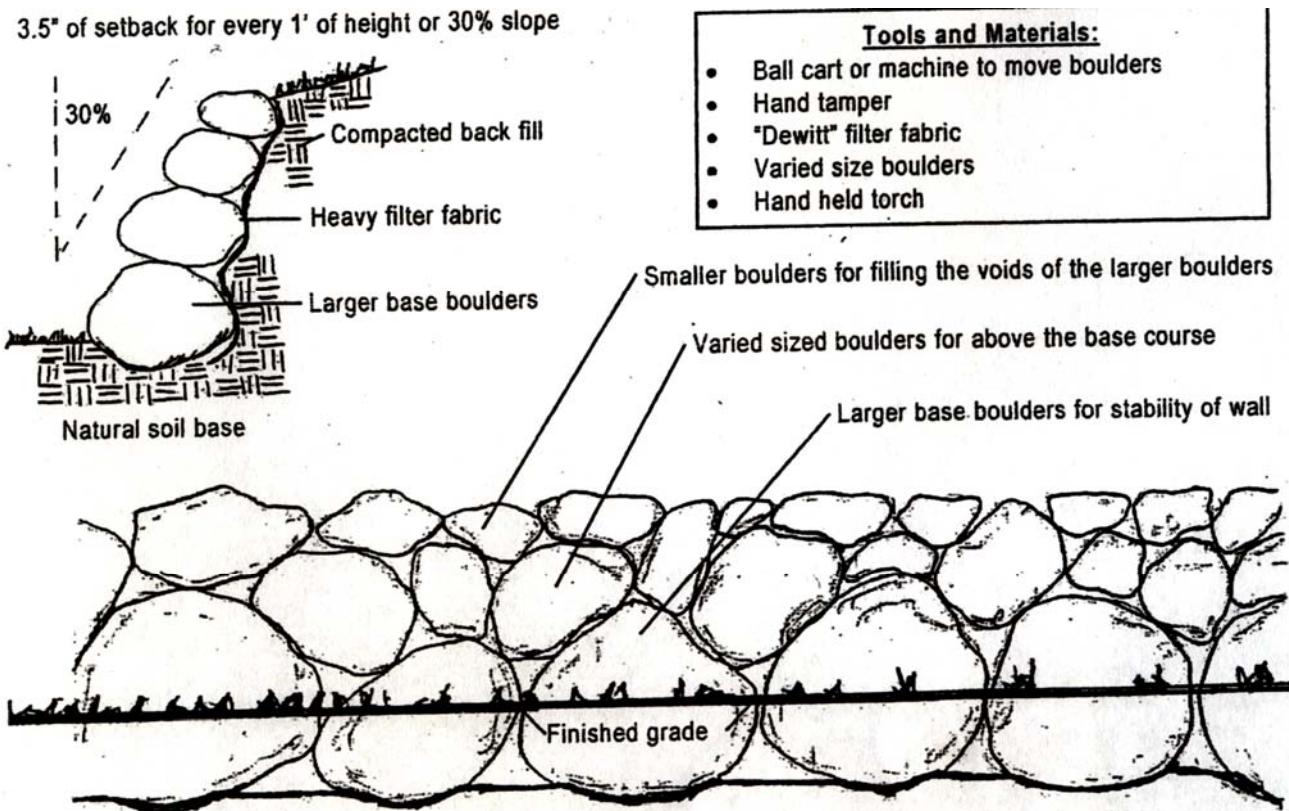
Illustration of a boulder wall construction including the 30 percent setback.
